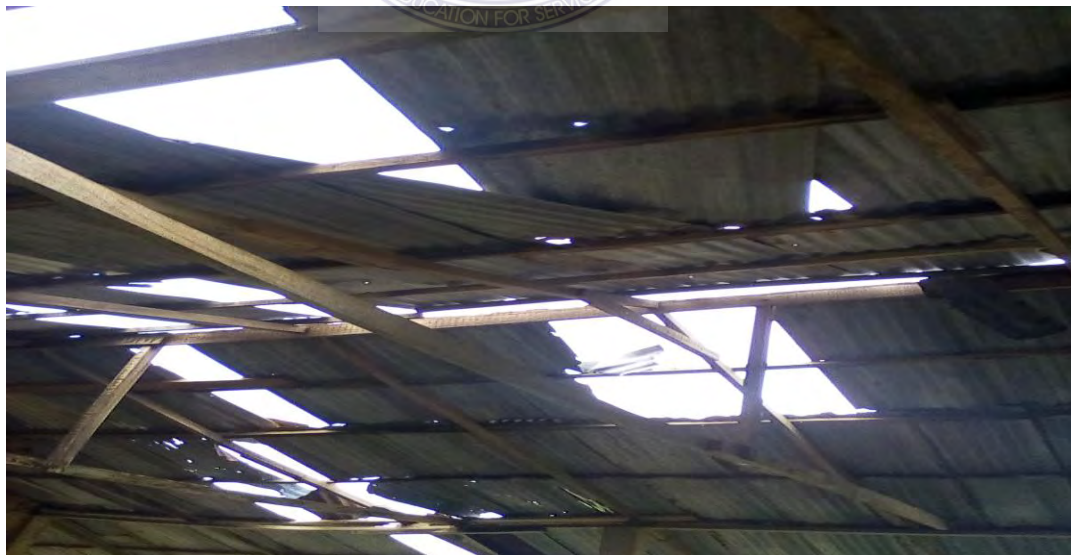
Badly damaged roof covering of Akenkanor D/A Basic School
